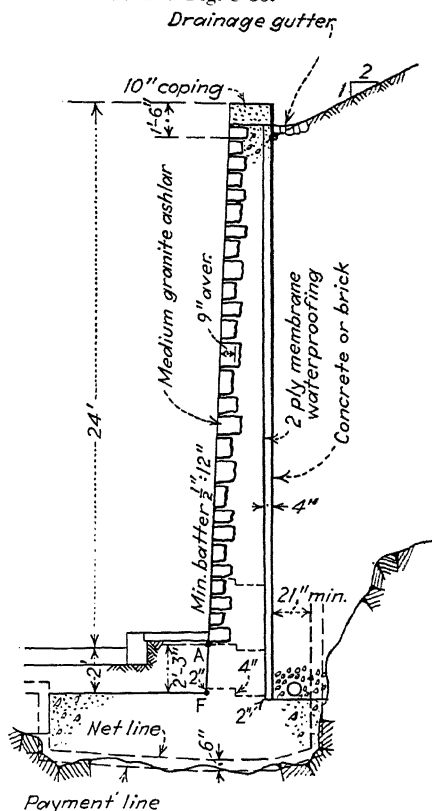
A masonry-faced wall with membrane waterproofing.
